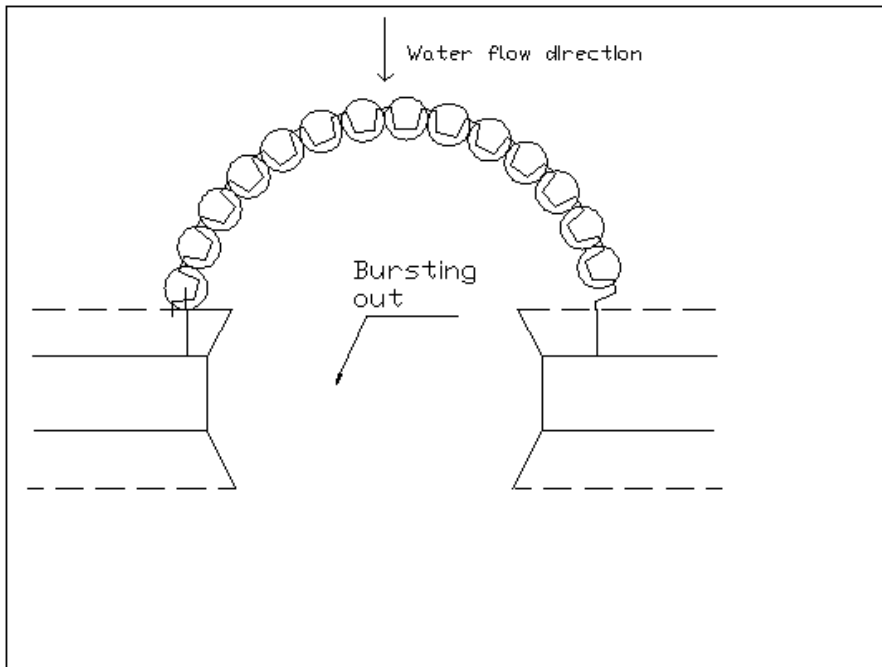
Local pilot hole plan of Larsen type steel sheet pile
